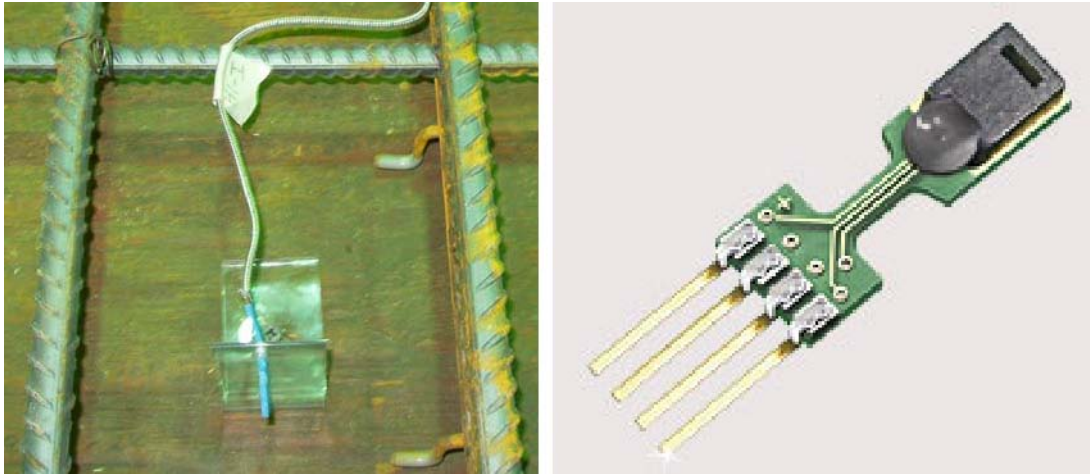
Rebar Layout of Slab Arrangement in Structures Laboratory
